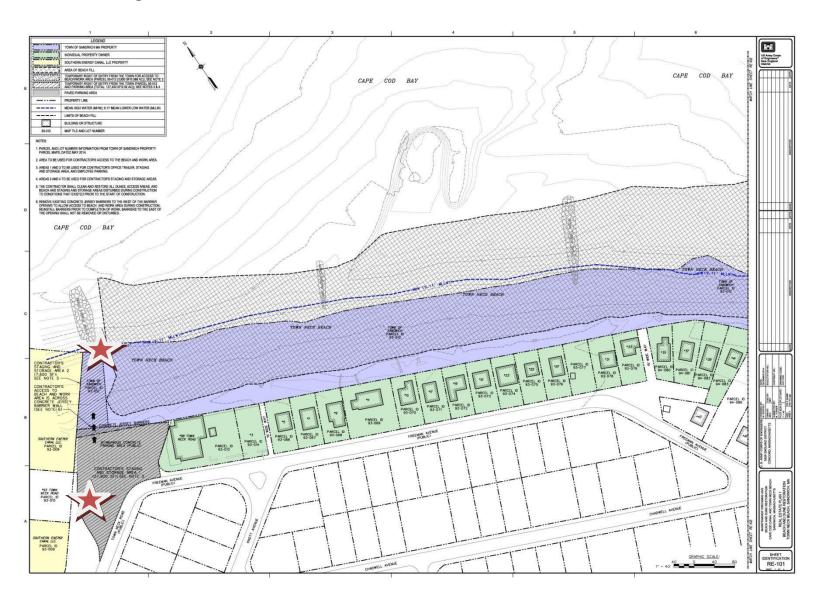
CCC Sandwich, MA Section 204 Beneficial Uses of Dredge Material Project Plan.
